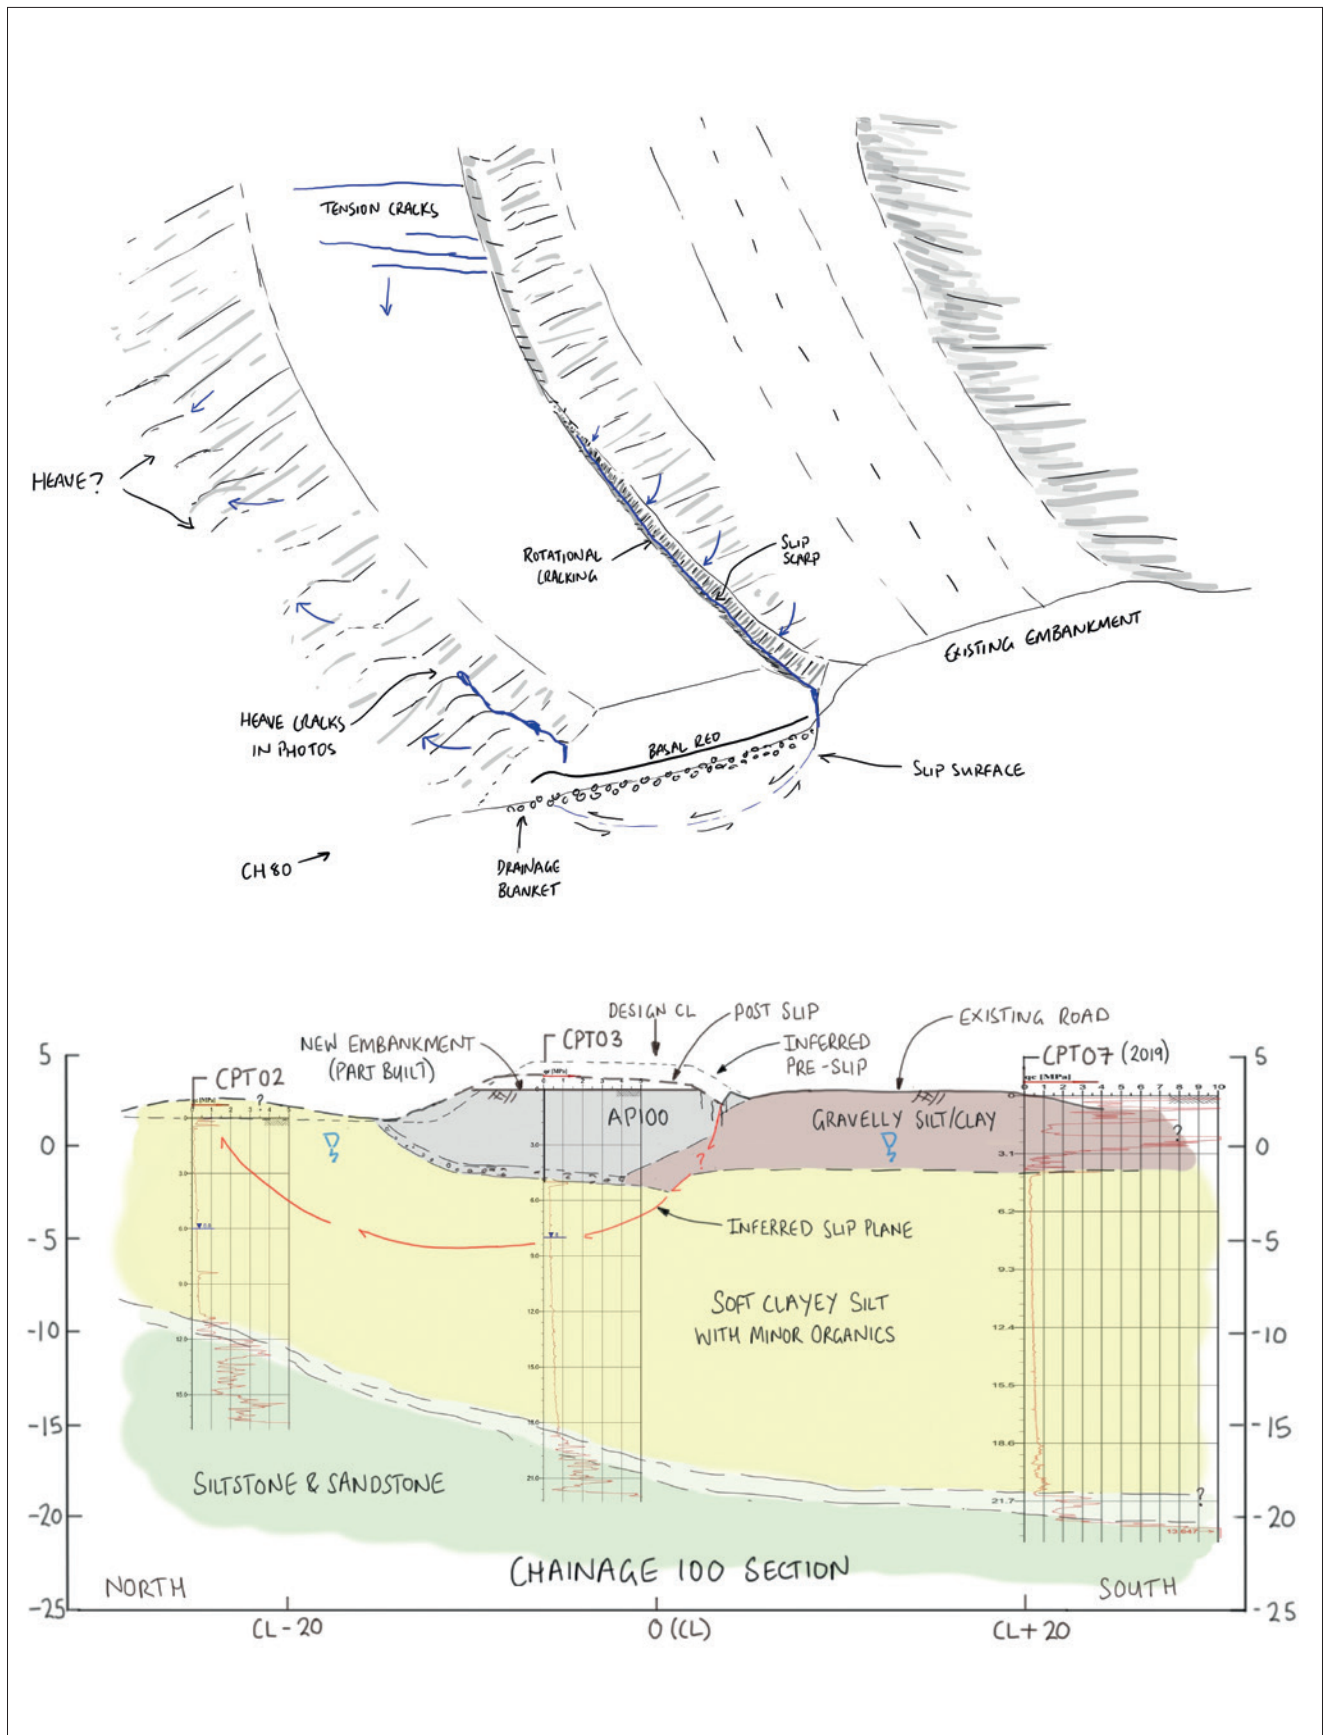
Conceptual block diagram of an embankment failure above, observational section below
